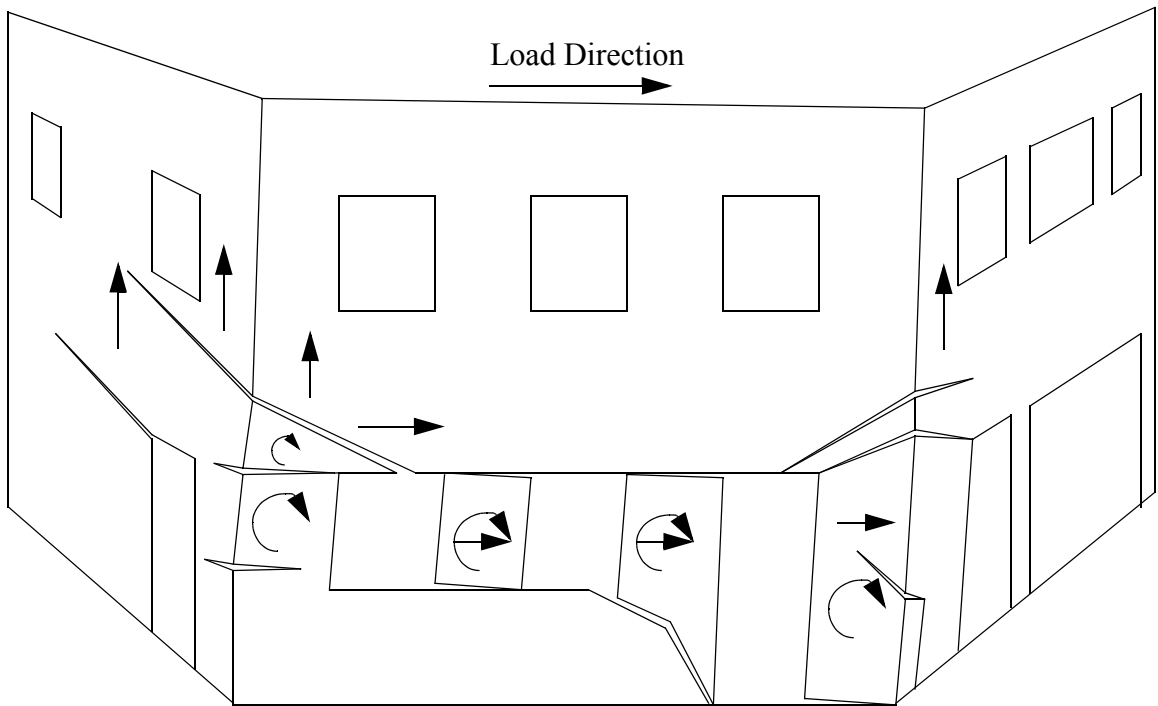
Exaggerated schematic illustrating the behavior of Wall A and out-of-plane Walls 1 and 2 in the positive direction following retrofit.
